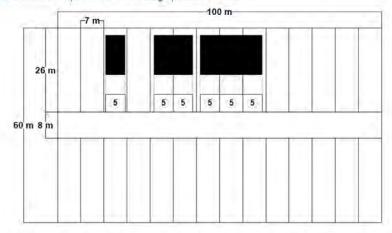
shows a larger family terrace 3+ bedroom typology with a rear access double garage. To encourage 2-bedroom terrace house the lot width should reduce to between 4.2m and 5m wide allowing for 2 upstairs bedrooms rooms front and back and a single garage of court or lane. If this configuration is used exclusively you achieve around 40 dwellings per hectare which pushes it into high density.
